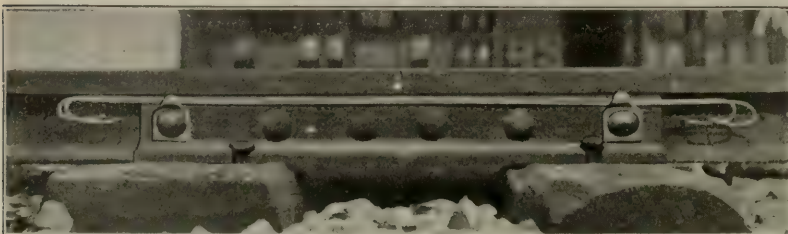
Type B, Style 1, Bond Wire Protectors in Service. P. &amp; M. Company.
